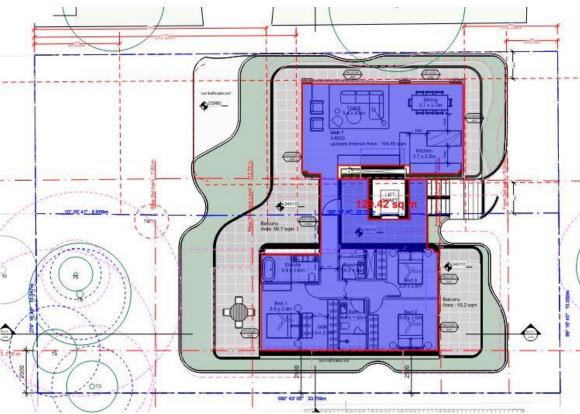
3rd floor plan (*Source: SOMA*) GFA measurement by Council Assessment Officer
